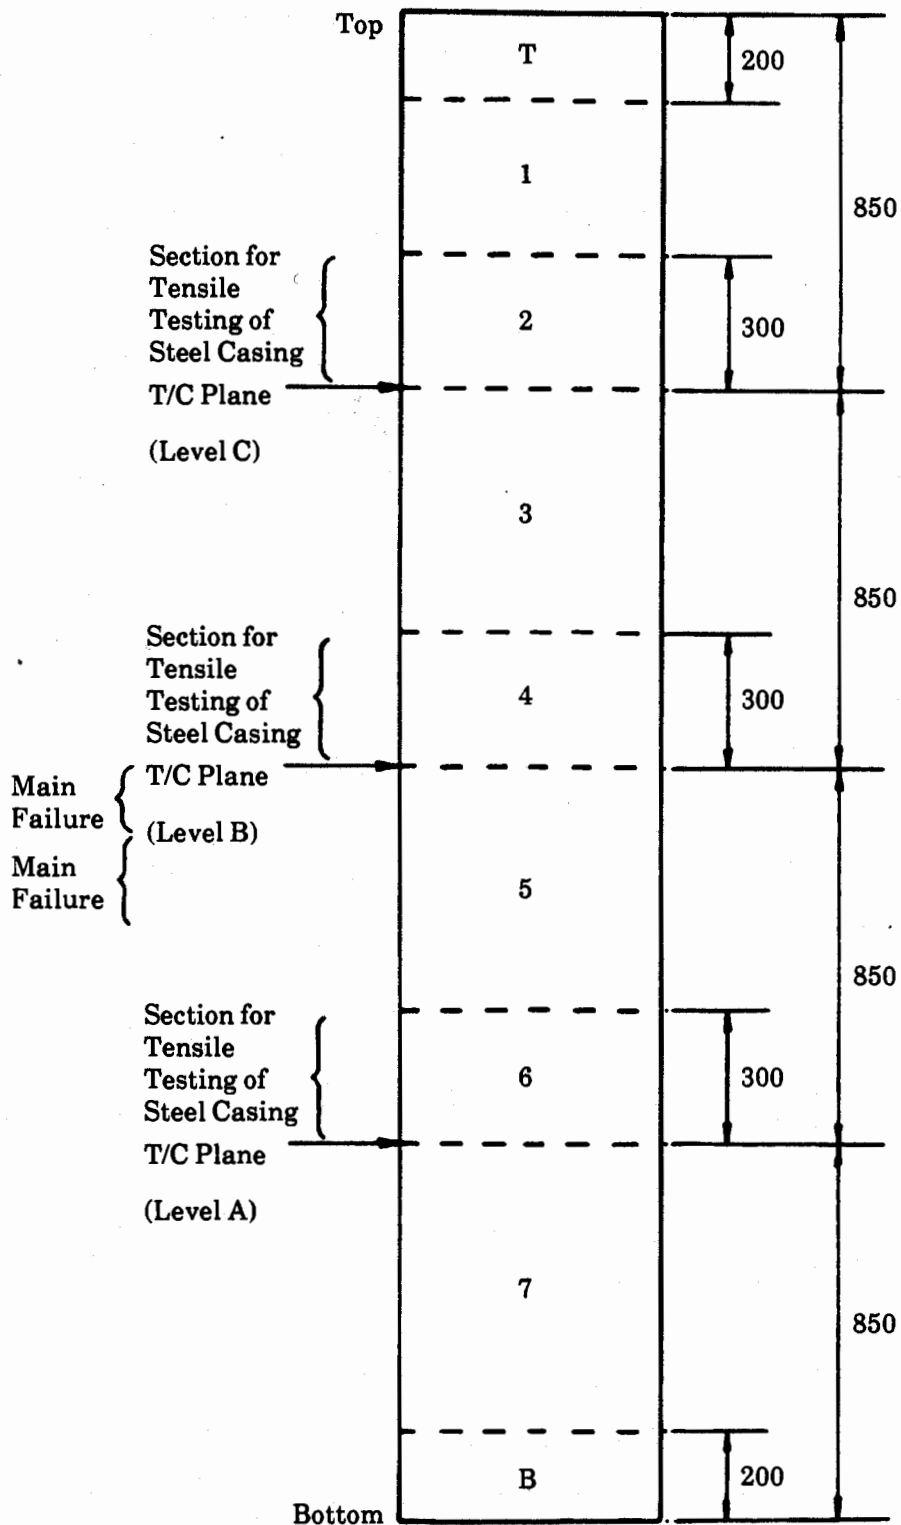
COLUMN NO. 1M49D, SECTIONING PLAN
